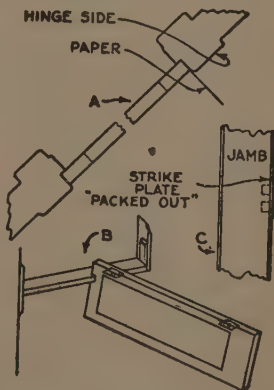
How to test and plane a sticking door; packing out a strike plate when a door will not catch.
